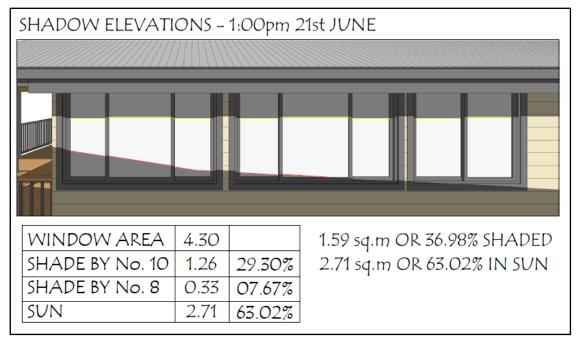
Revised shadow elevations for 10 Admiralty Crescent at 1:00 pm
